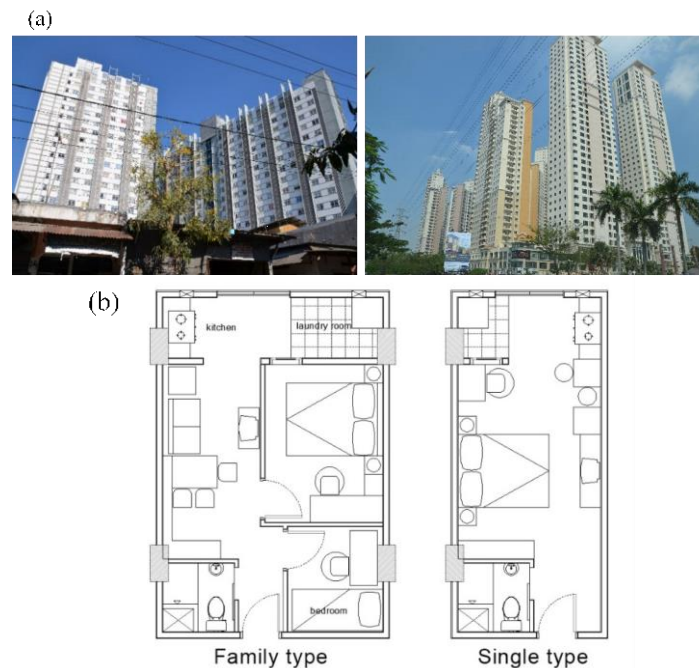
(a) Views of private apartments and (b) typical floor plan of unit of private apartment.
